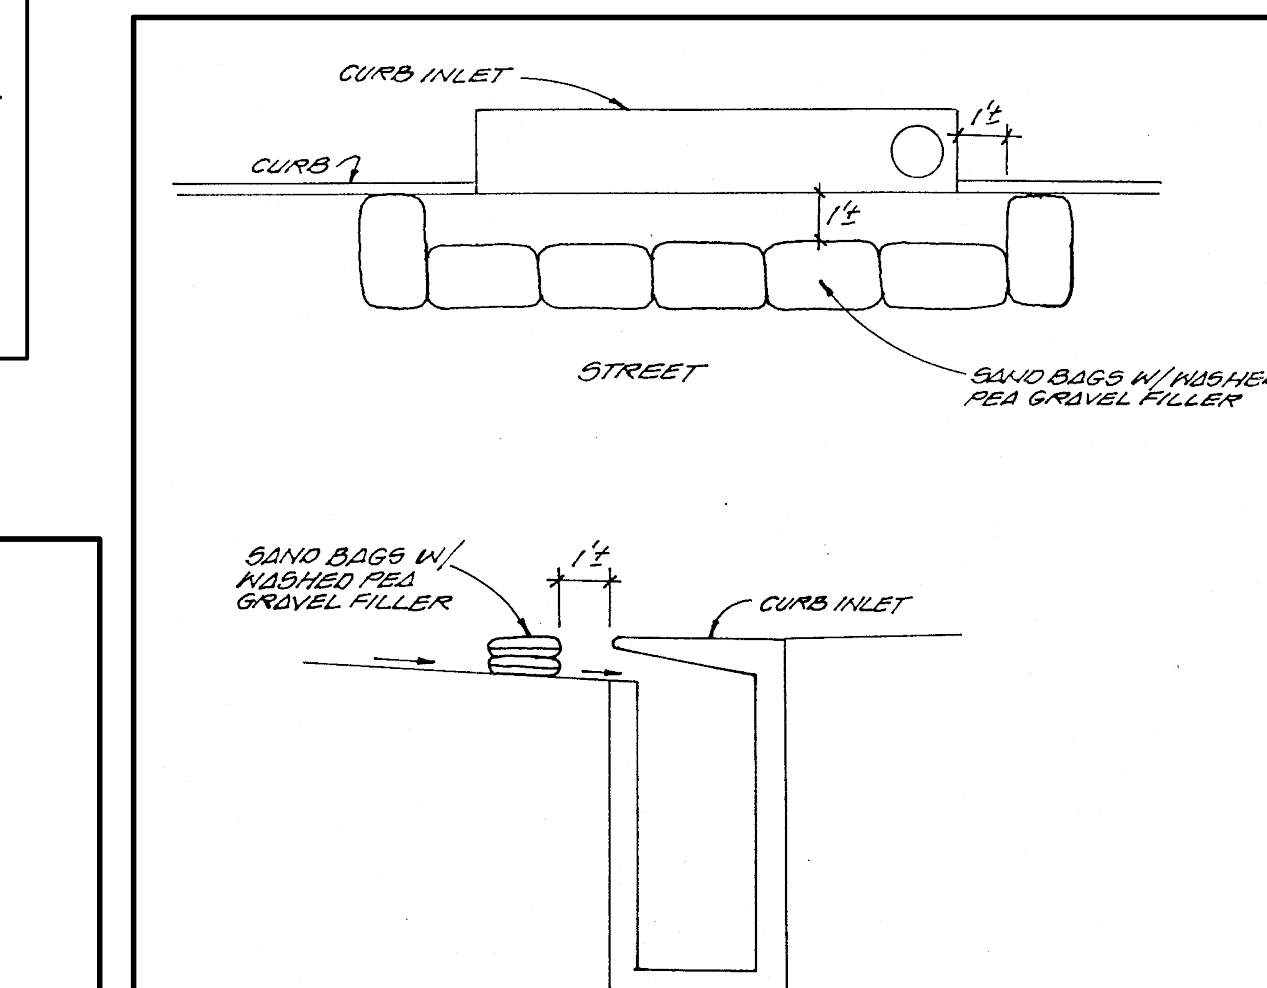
Diagram of Bagged Gravel Curb Inlet Protection (Pape-Dawson)
